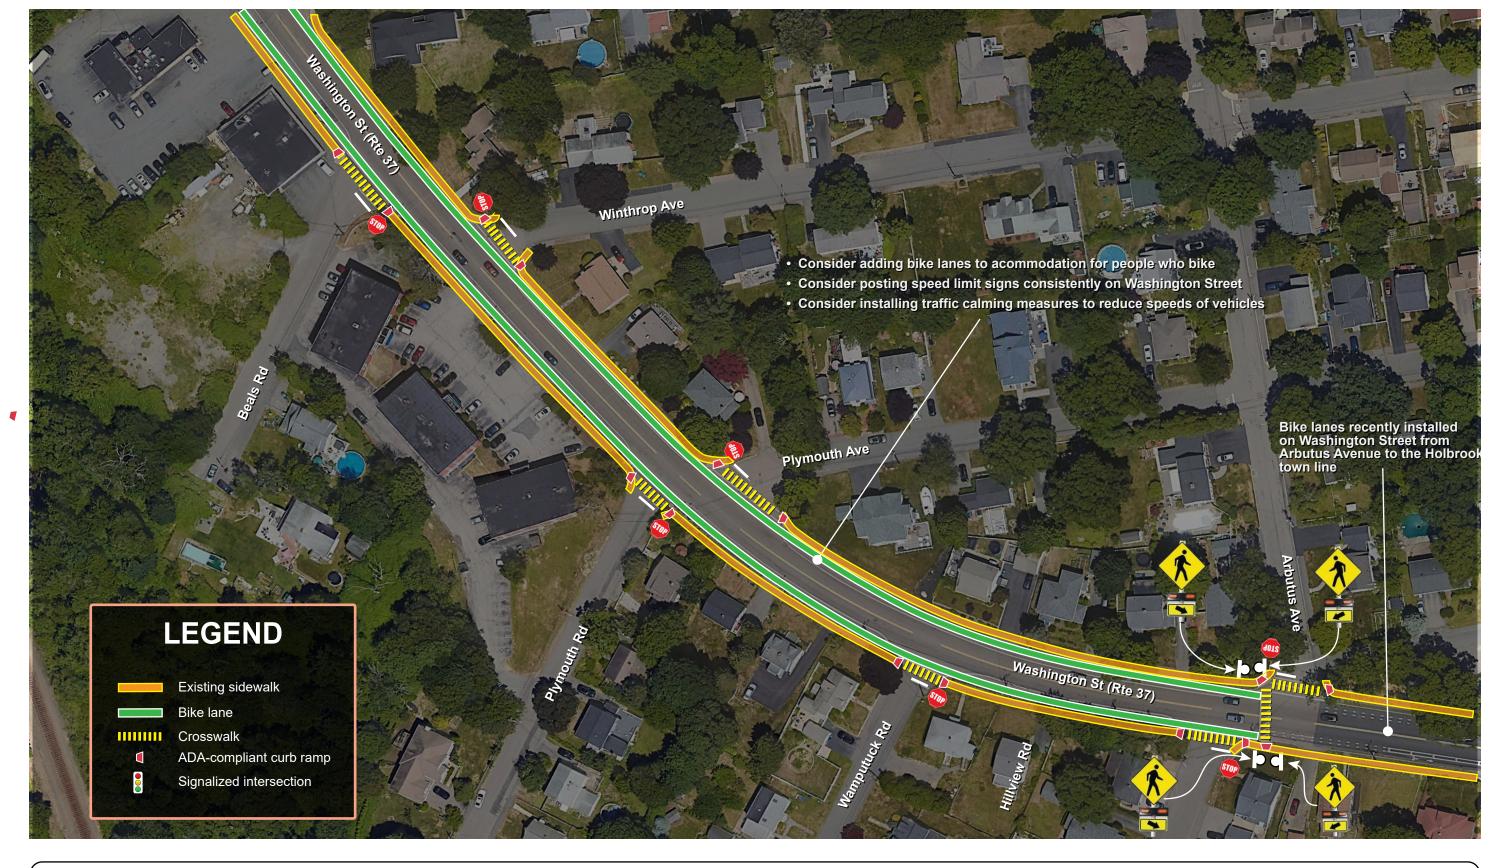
Proposed Improvements Washington Street at Arbutus Avenue
